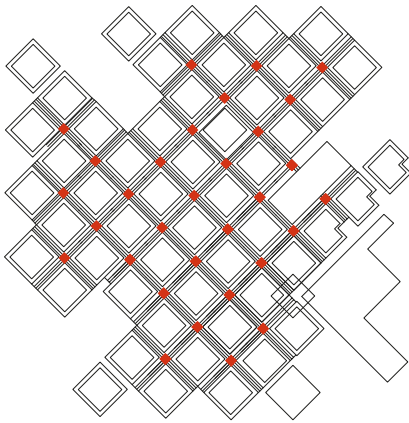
Mechanical ventilation system on roof plan (the ventilator can be increased to a maximum to 31 to have a better indoor climate) (M.Wang, 2017)
